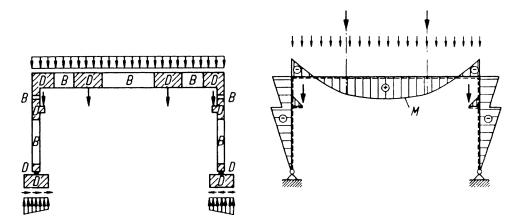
Frame structure containing substantial part of B regions, its statical system, and bending moments (Schlaich et al. 1987).
